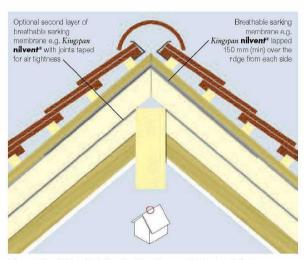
Ridge Detail - Section Perpendicular to Ridge
